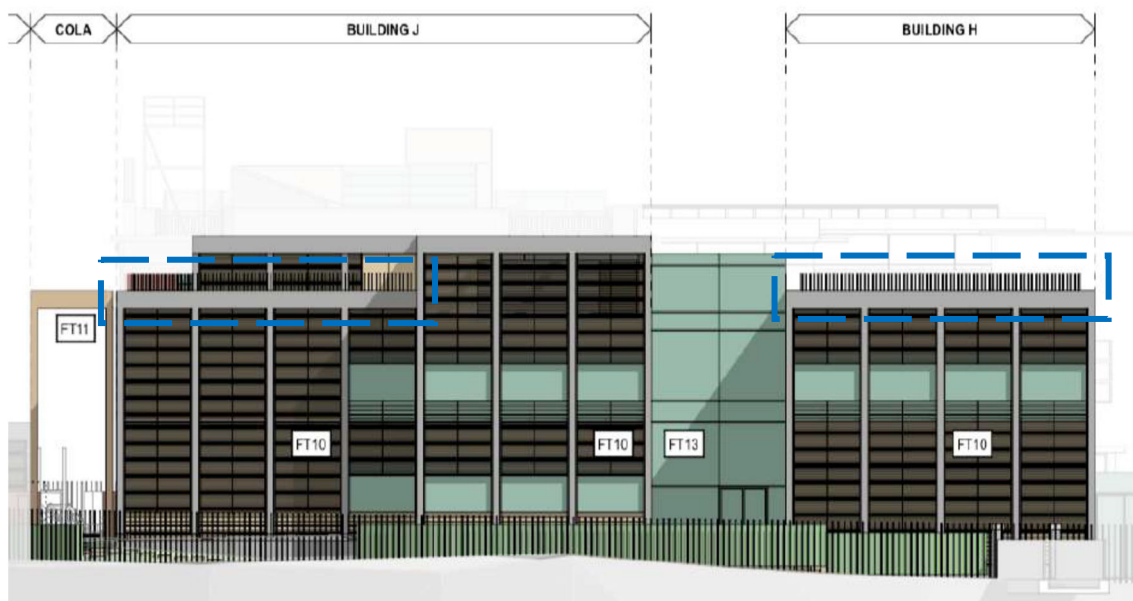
The SSD HIS, with the Safety Protection Structures to Buildings J & H indicated in dash blue outline (Figure 8.47: Building J & H, Southern elevation (Source: FJMT, DA-5908, 18.12.19)).
